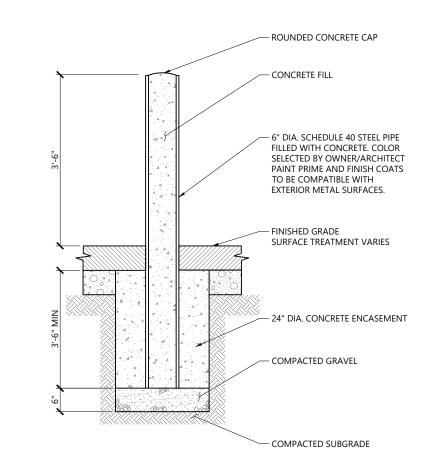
DETAIL DEPICTS SIDEWALK CONDITION ALTHOUGH THE SAME CROSS SECTION SHALL BE USED FOR CURB RAMPS OR DRIVEWAYS.
